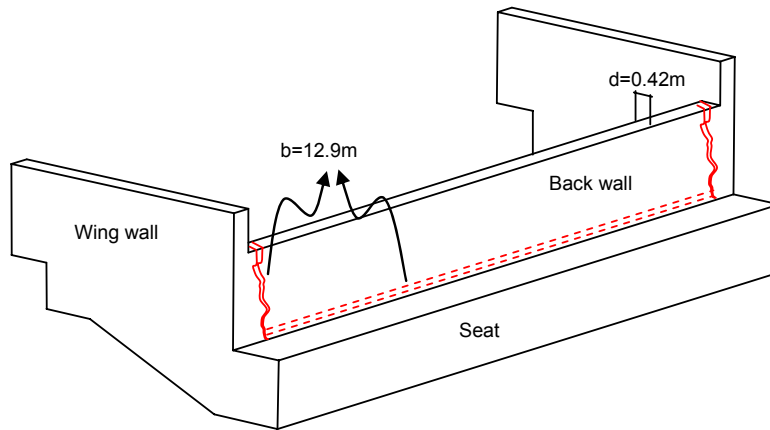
Assumed shear failure mode of abutment backwall
